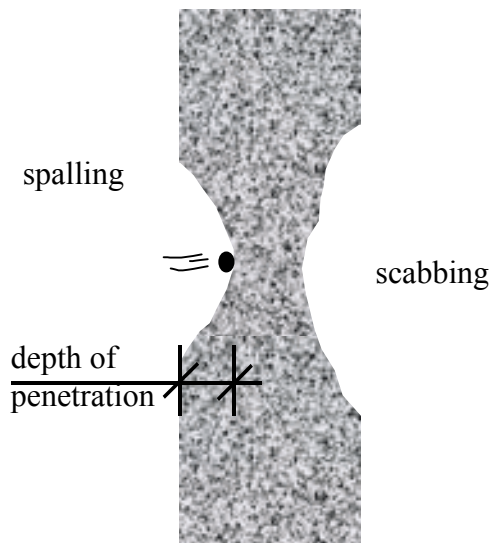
Definitions of depth of penetration, spalling and scabbing. Spalling takes place on the exposed side of the concrete wall and scabbing on the reverse side of the wall.
